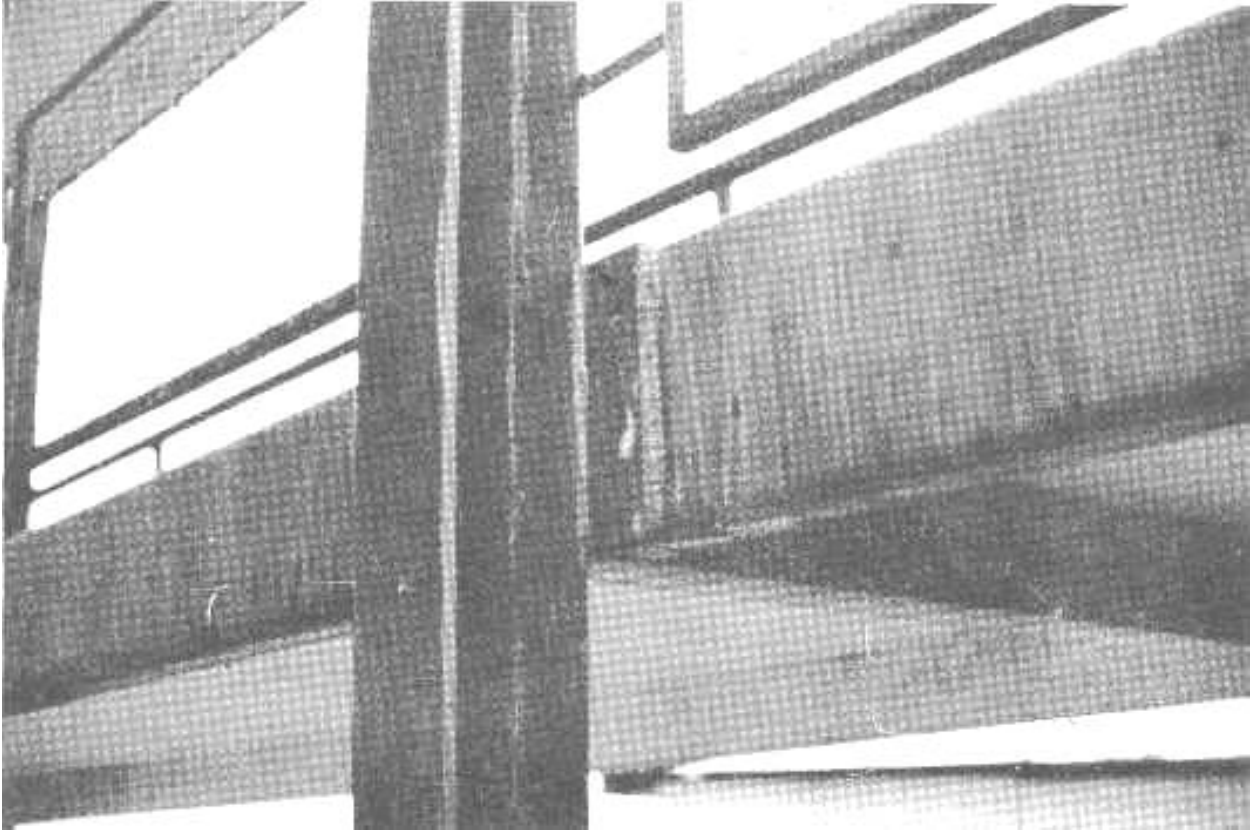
B: Critical Structural Details : beam column connection The beam springer is welded to the column at the shop, so at the site weld connections are done out damage exposed zones
